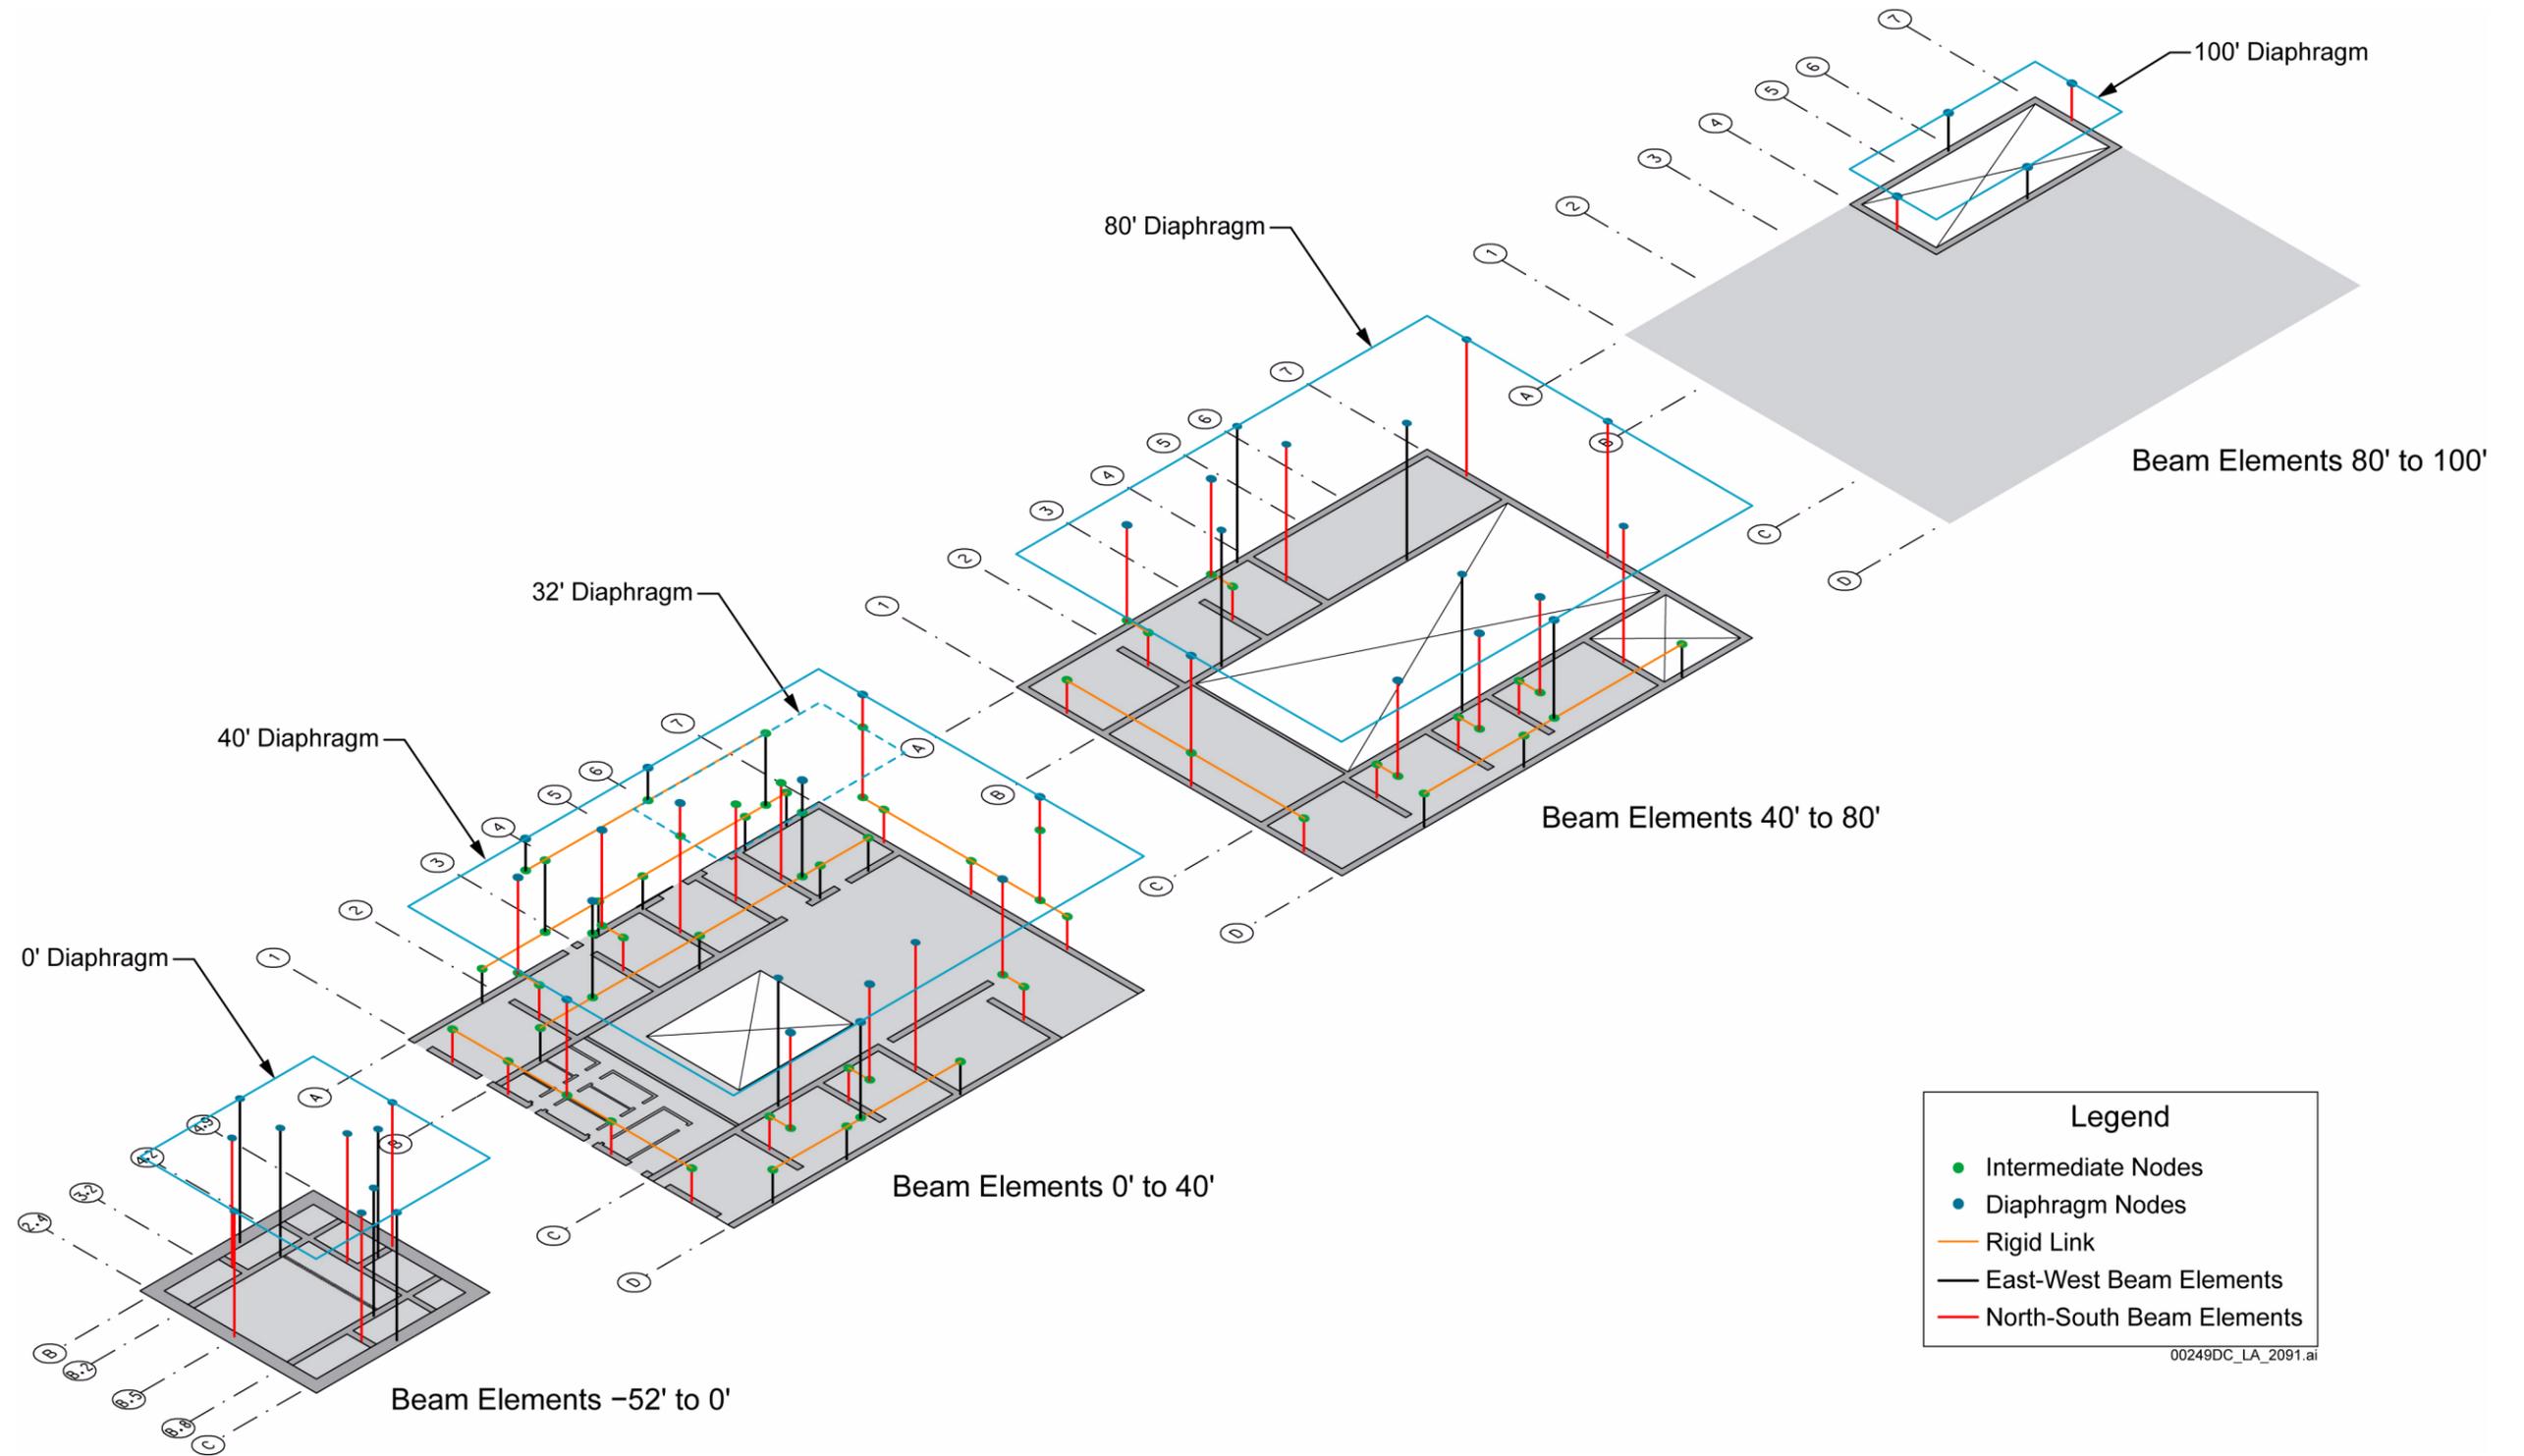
Wet Handling Facility Lumped-Mass, Multiple-Stick Model
